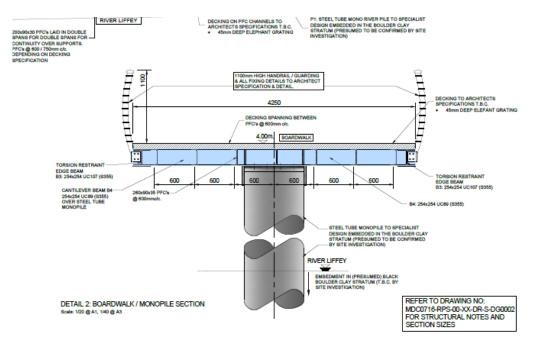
Elevation view Ringsend 04 (Free-standing element)
